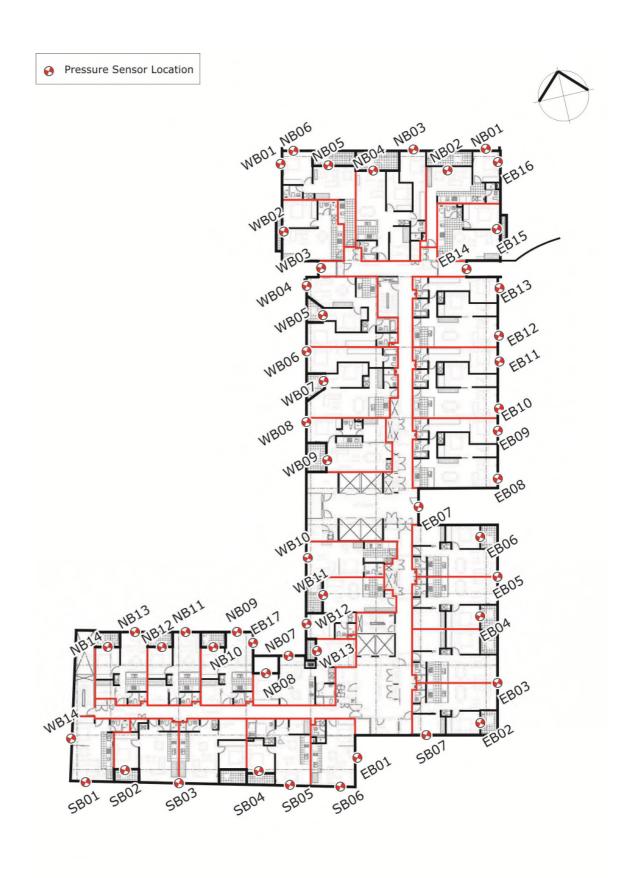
Opening Locations and Internal Apartment Layout - Level 3
